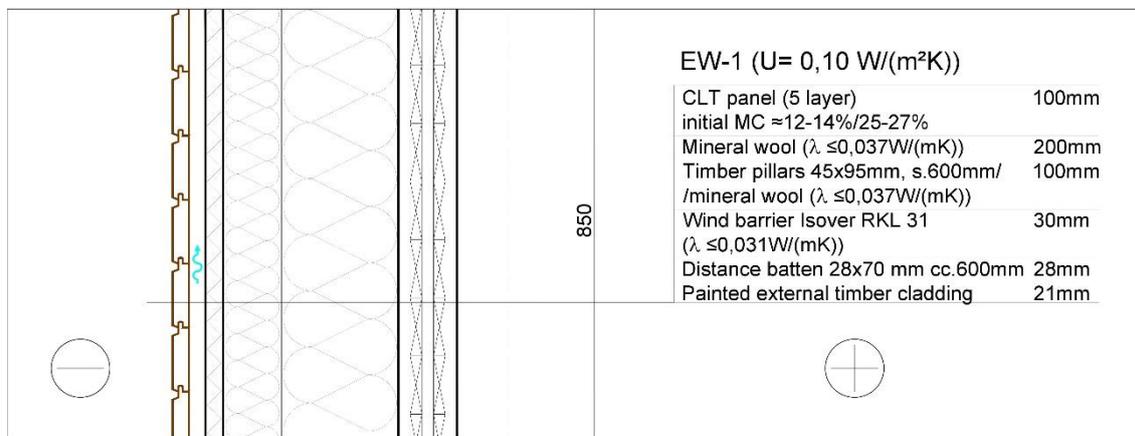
Section of the wall type EW-1 where CLT panel is exposed to internal room and mineral wool as the insulation material (Technical drawing by Villu Kukk adjusted by the author).
